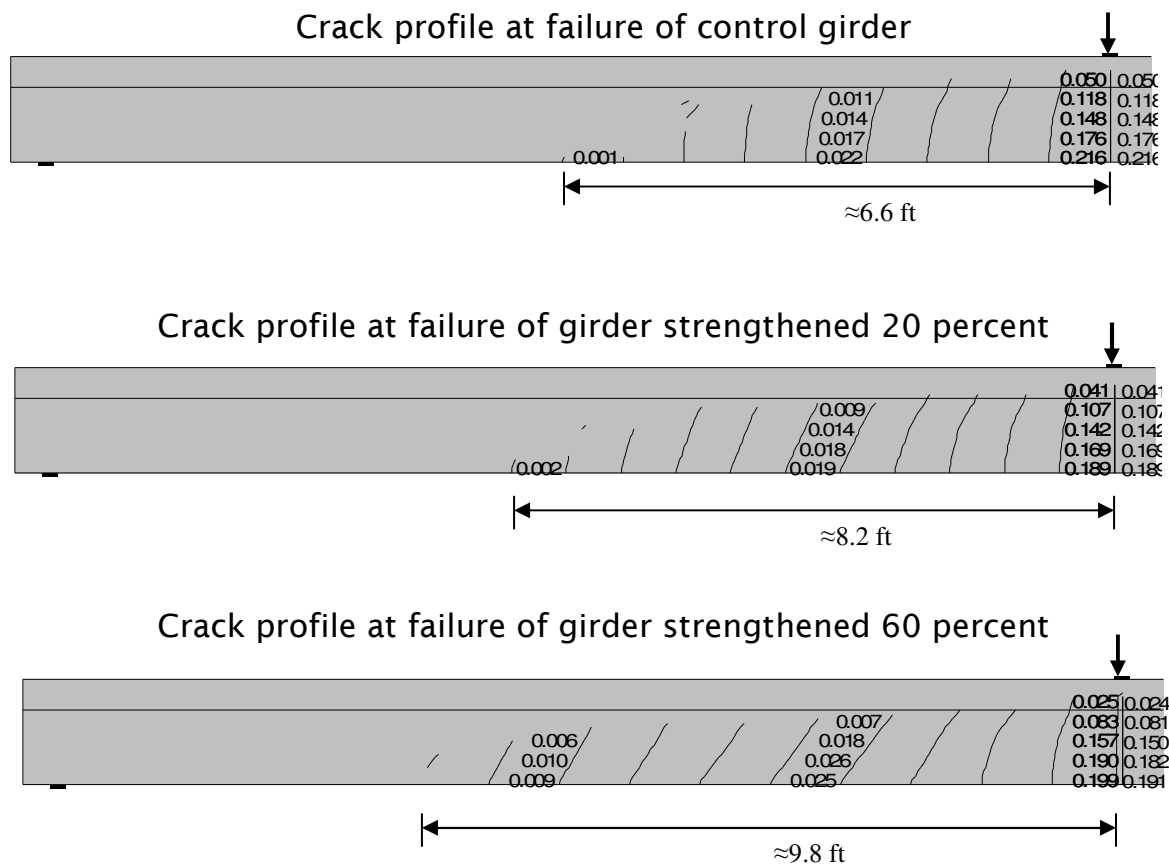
Response 2000[®] crack patterns and widths of control and strengthened C-Channel girders (in inches)
